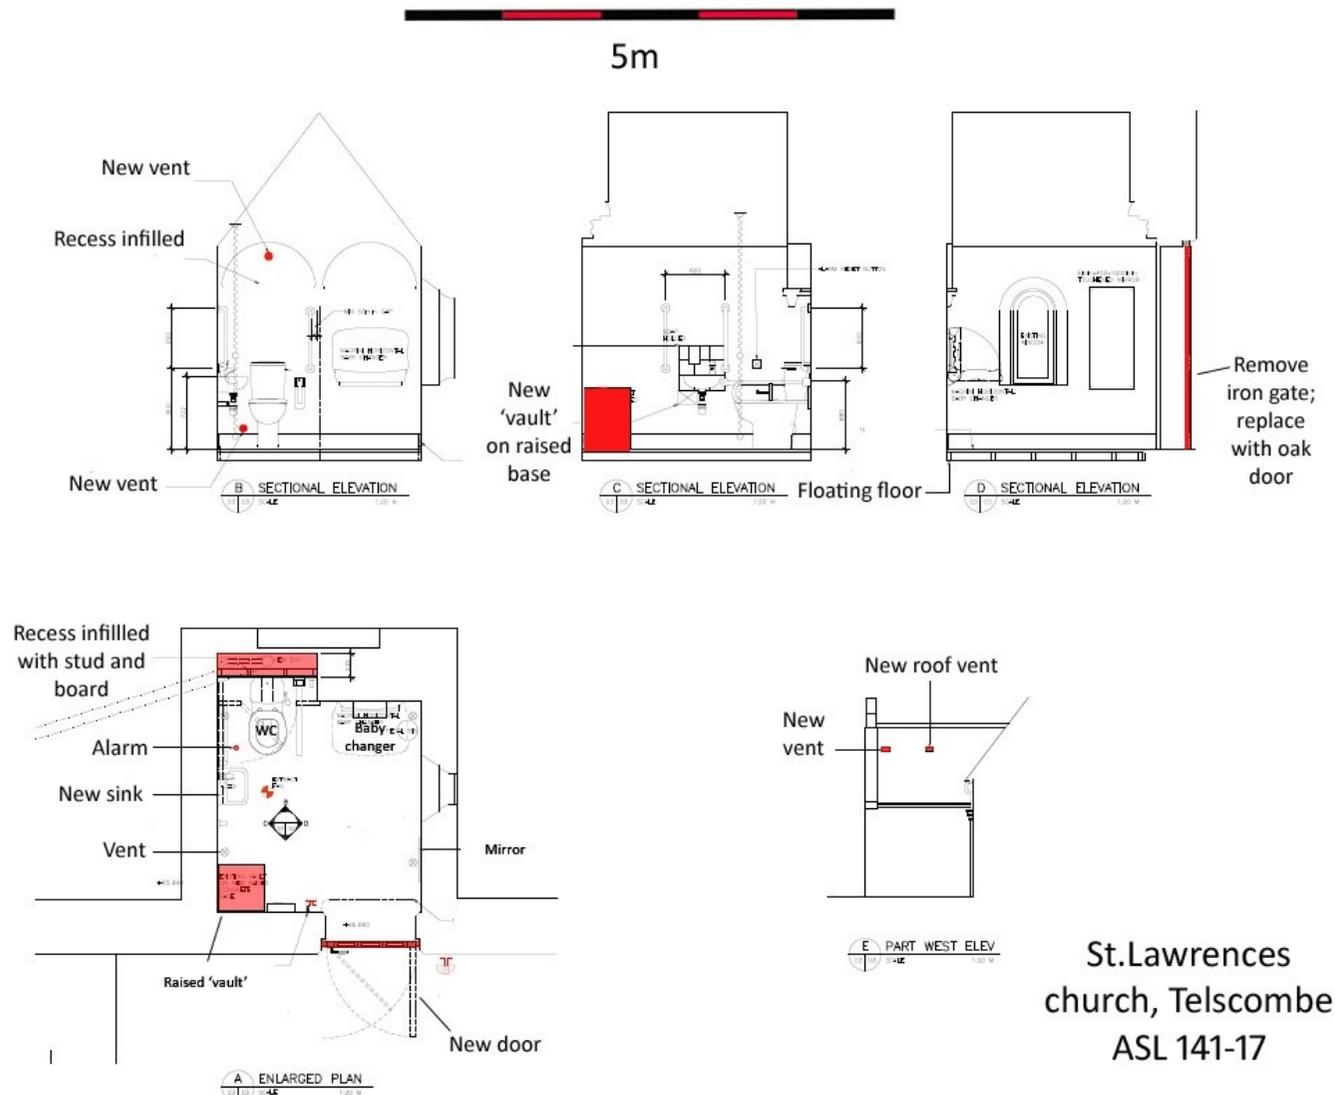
Proposed sections based on J.D.Clarke's plans drawing No.10301/03 (Rev.A).
